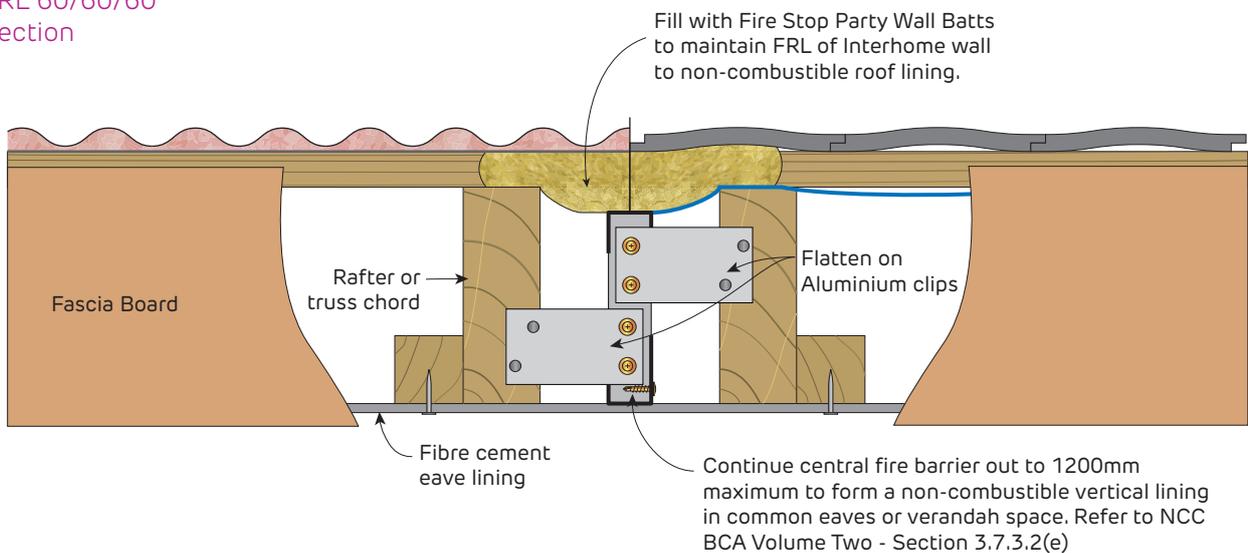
Interhome over Eave End Detail for Class 1 Buildings
